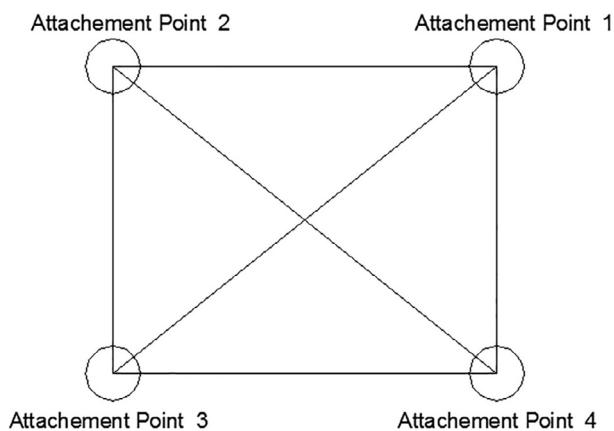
Steel bracing attached to the concrete element at point 1, 2, 3, and 4.
